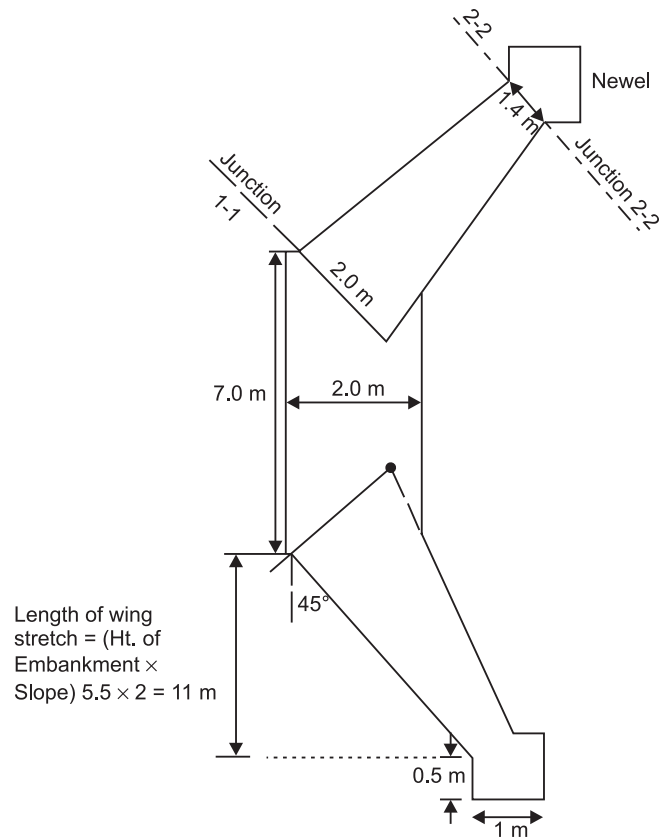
Foundation plan of the splayed wing (Example 5.2).
